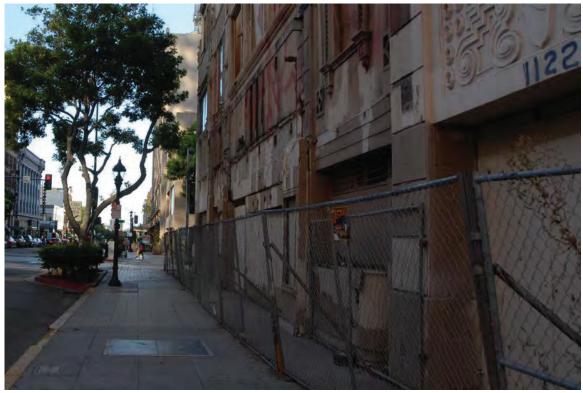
4th Avenue façade, location of former marquee. view facing southwest.
